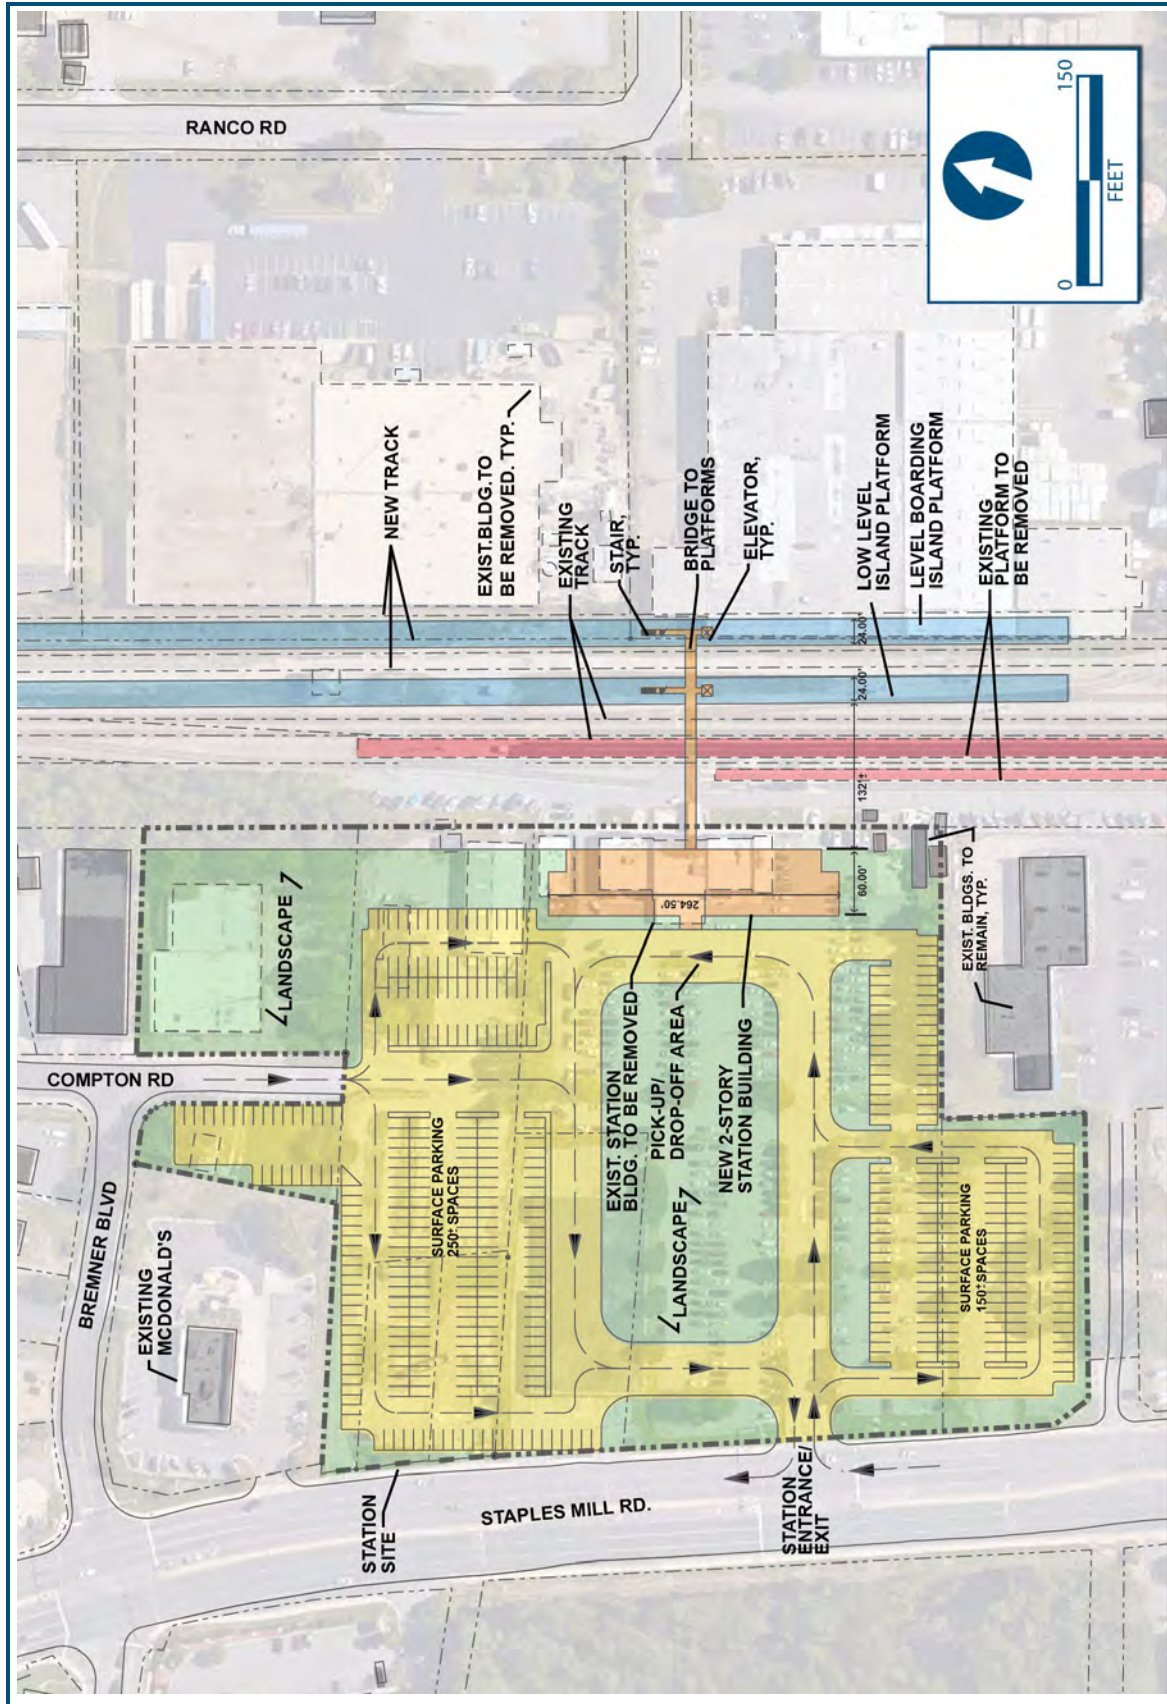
Staples Mill Road Station Improvements for Build Alternative 6F
